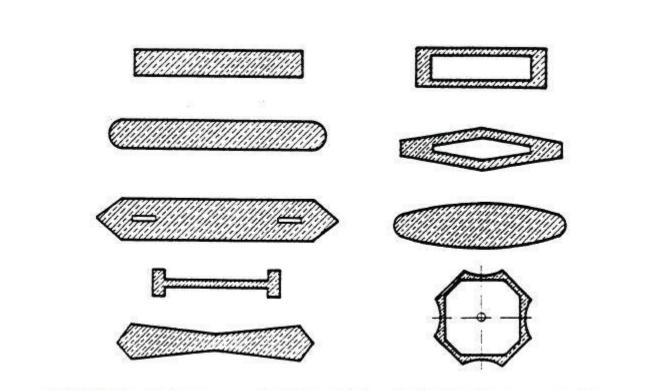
Typical cross-section shapes of piers for river and waterway crossings.
